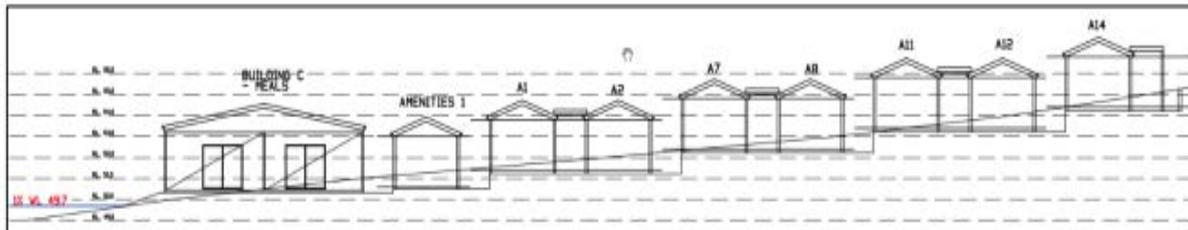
Cross-section through development showing buildings and 1% AEP flood level (PDA Stormwater Report – Revision 3, dated 25 Jan 2024).
